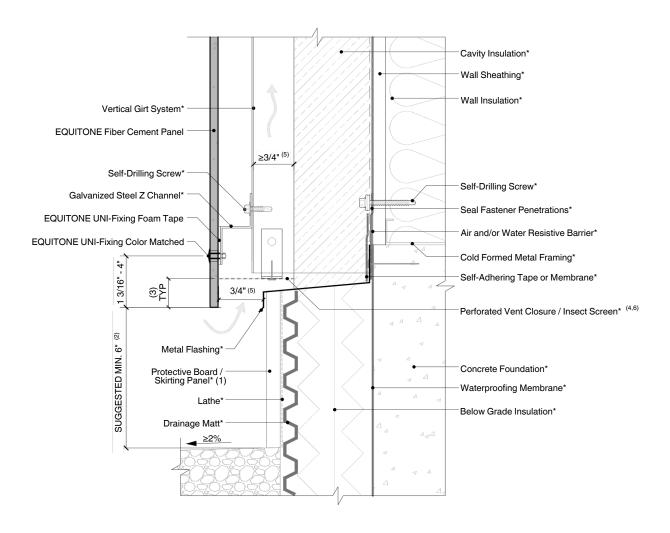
DETAIL #:EQ-EF-VG-SS-CHJ RELEASE:202412
